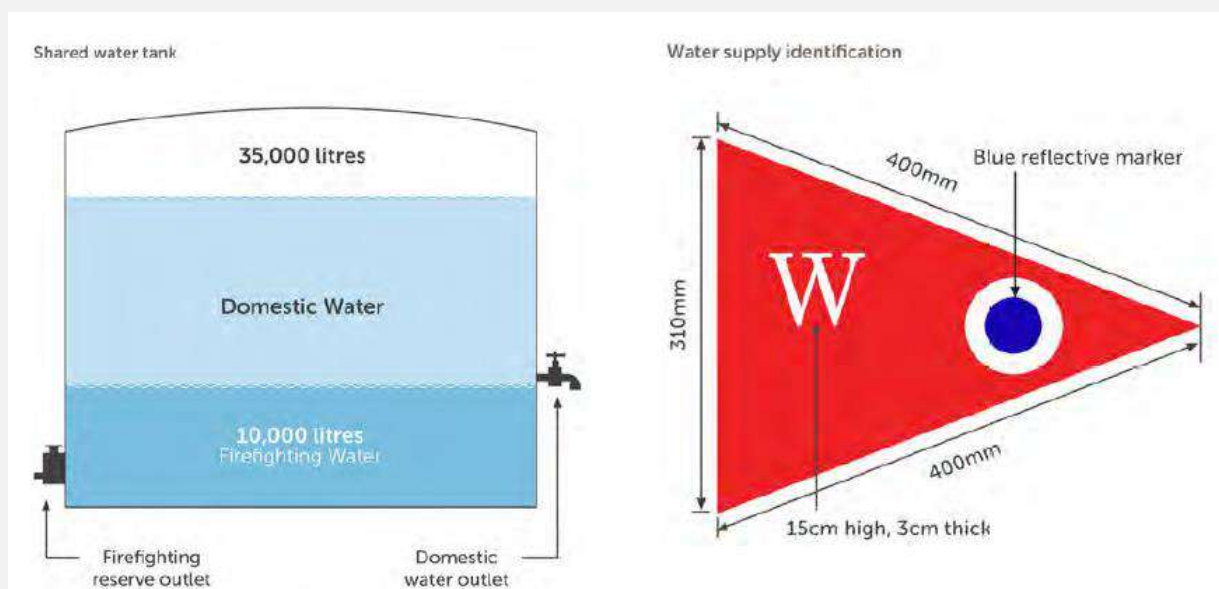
Water Tank Requirements (source: Technical Guide: Planning Permit Applications in the Bushfire Management Overlay – Sept 2017)
